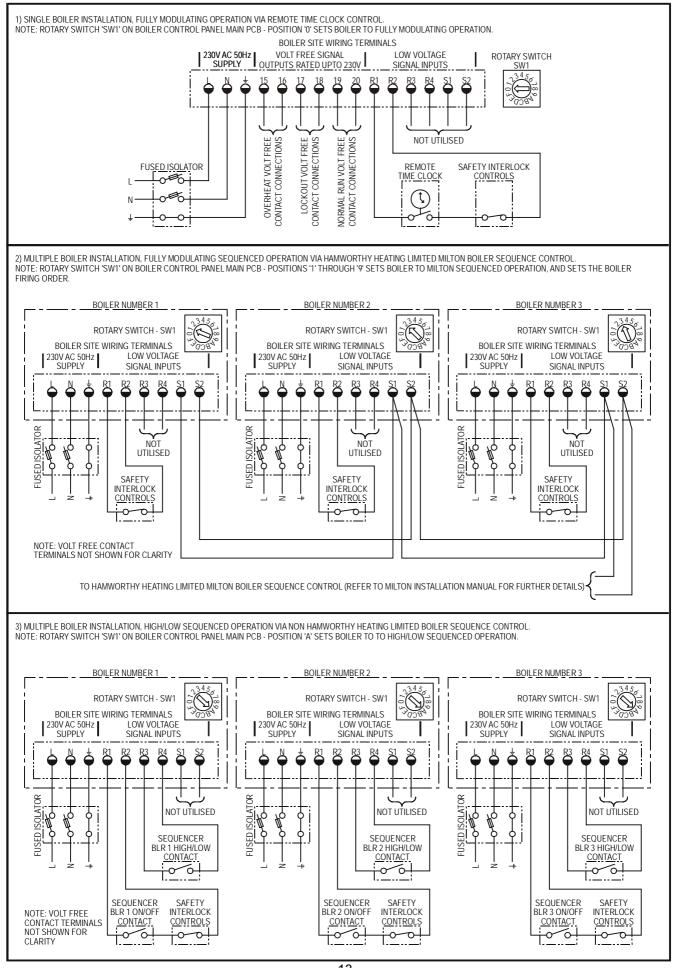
Site Wiring Connections - Control Panel Layout
